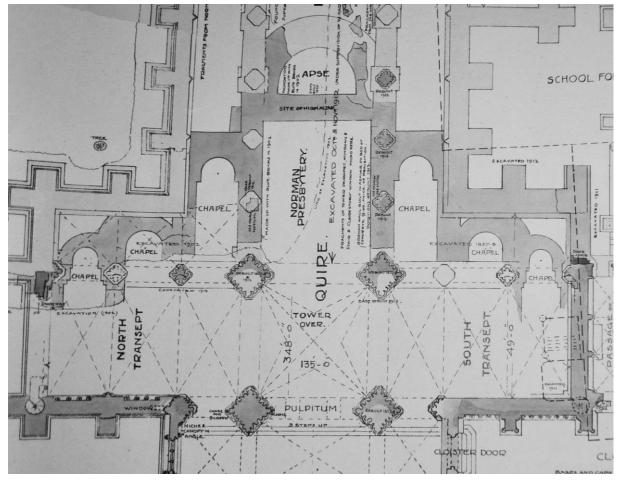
Architectural plan of St Mary's Abbey by Edwin Ridsdale Tate in 1914, based on the original 1827–29 plan.
